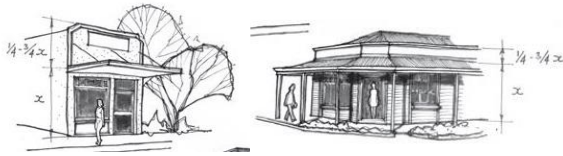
Raglan town centre - sketch illustrating verandah and parapet styles: (left) a flat or horizontal plane verandah roof either supported by steel rods, or with an integrated supporting structure hidden within the roof plane; (right) pitched roof or lean-to style supported by poles at the edge of the verandah.
